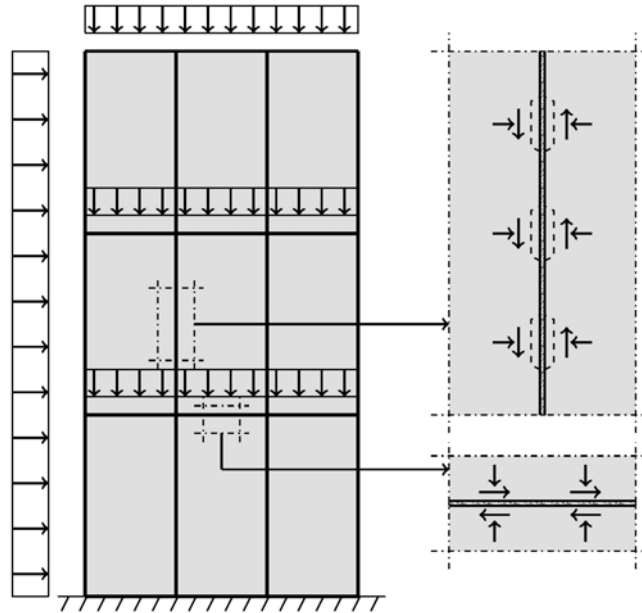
Example of external horizontal and vertical loads on a structure, which introduce normal and shear forces to be transferred across the connections between the precast reinforced concrete elements.
